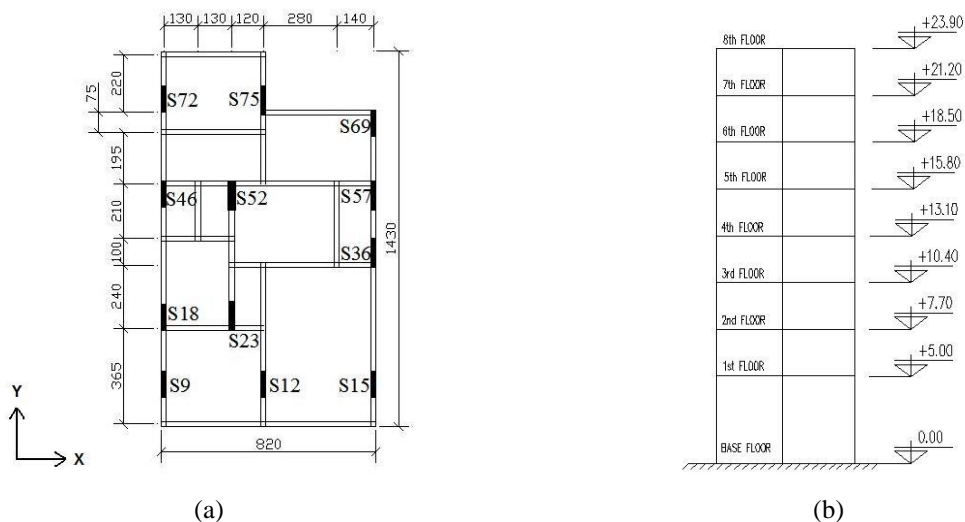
(a) Plan View (cm), (b) Lateral View (m)
